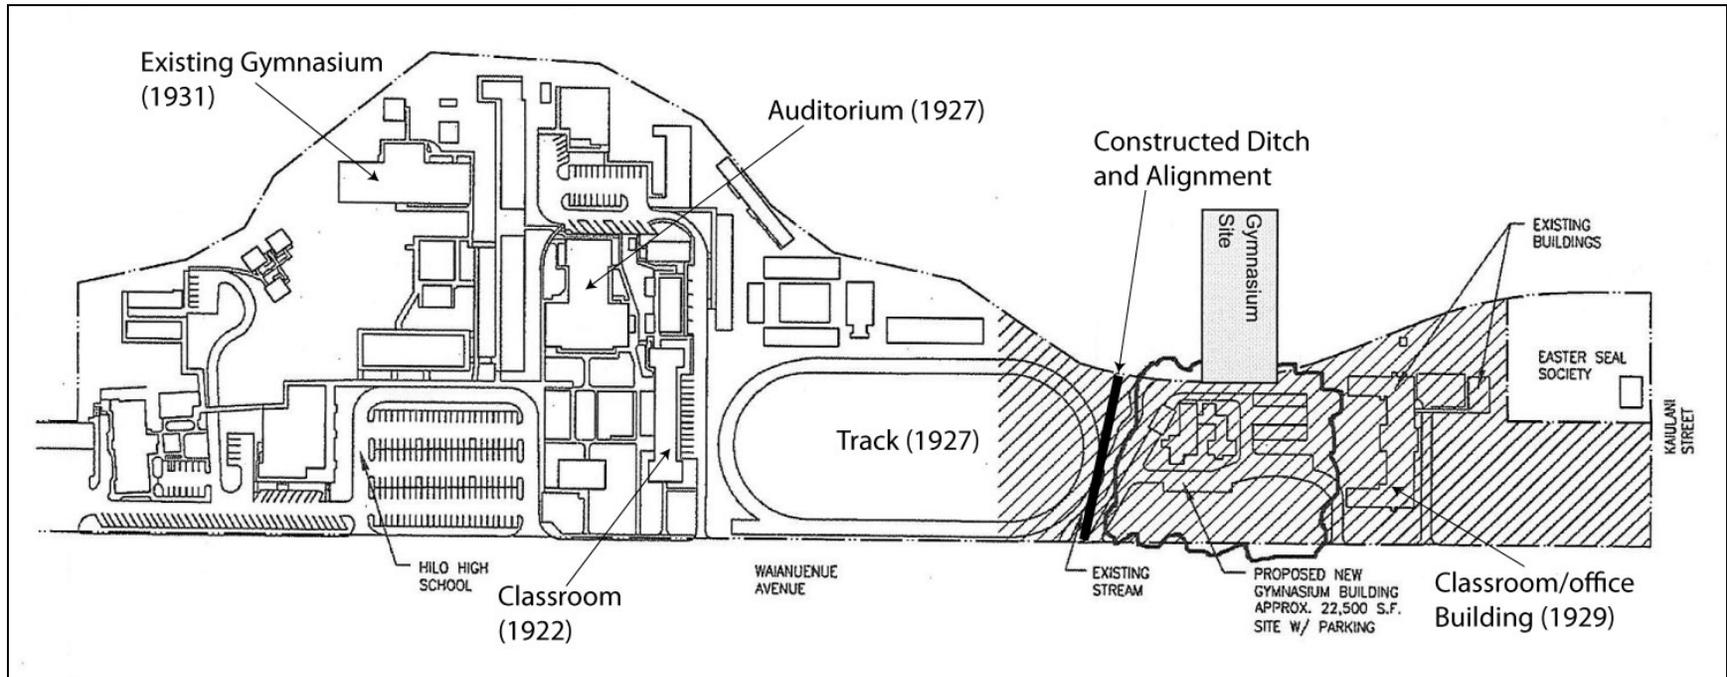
Plan of Hilo High School showing proposed general location for a new gymnasium and associated parking
